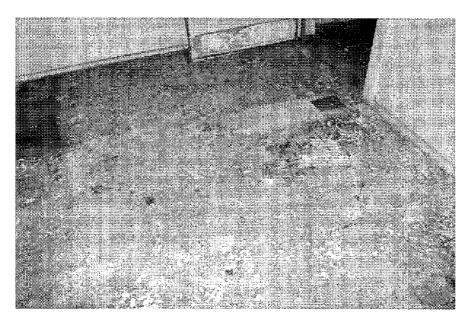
Vinyl floor tiles containing asbestos located in the back room of the ground floor residential tenancy at 91A Liverpool Road.
